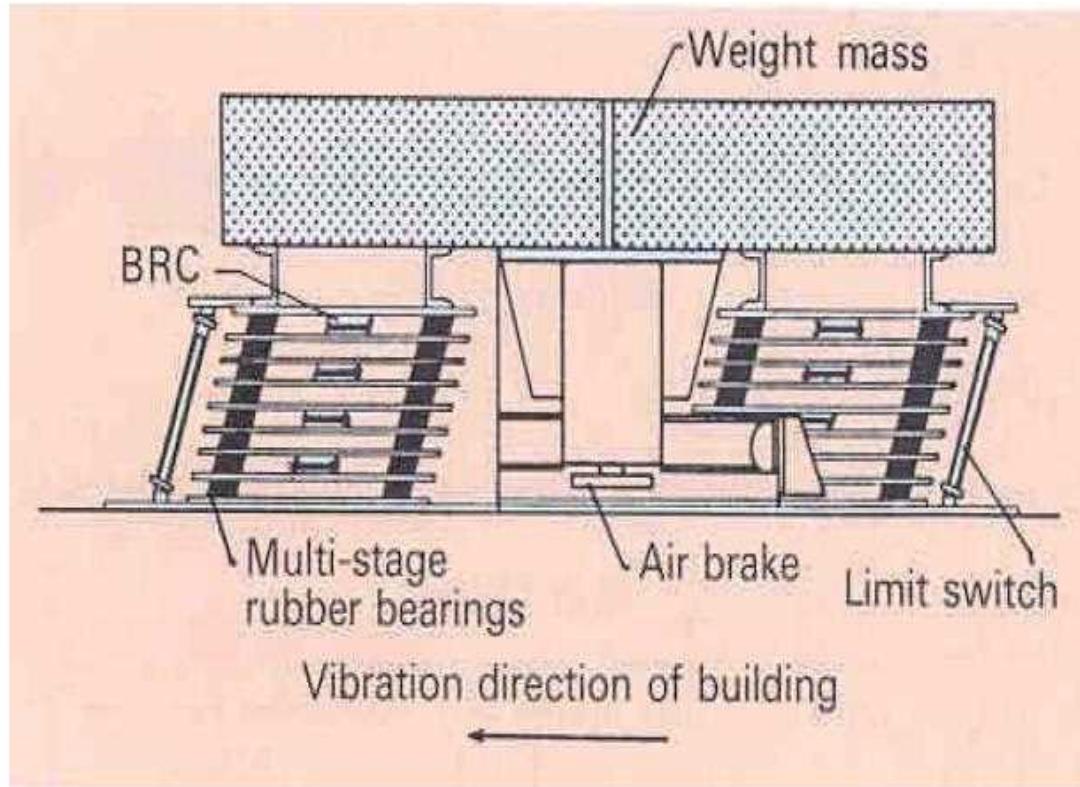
Tuned mass damper with spring and damper assemblage.
